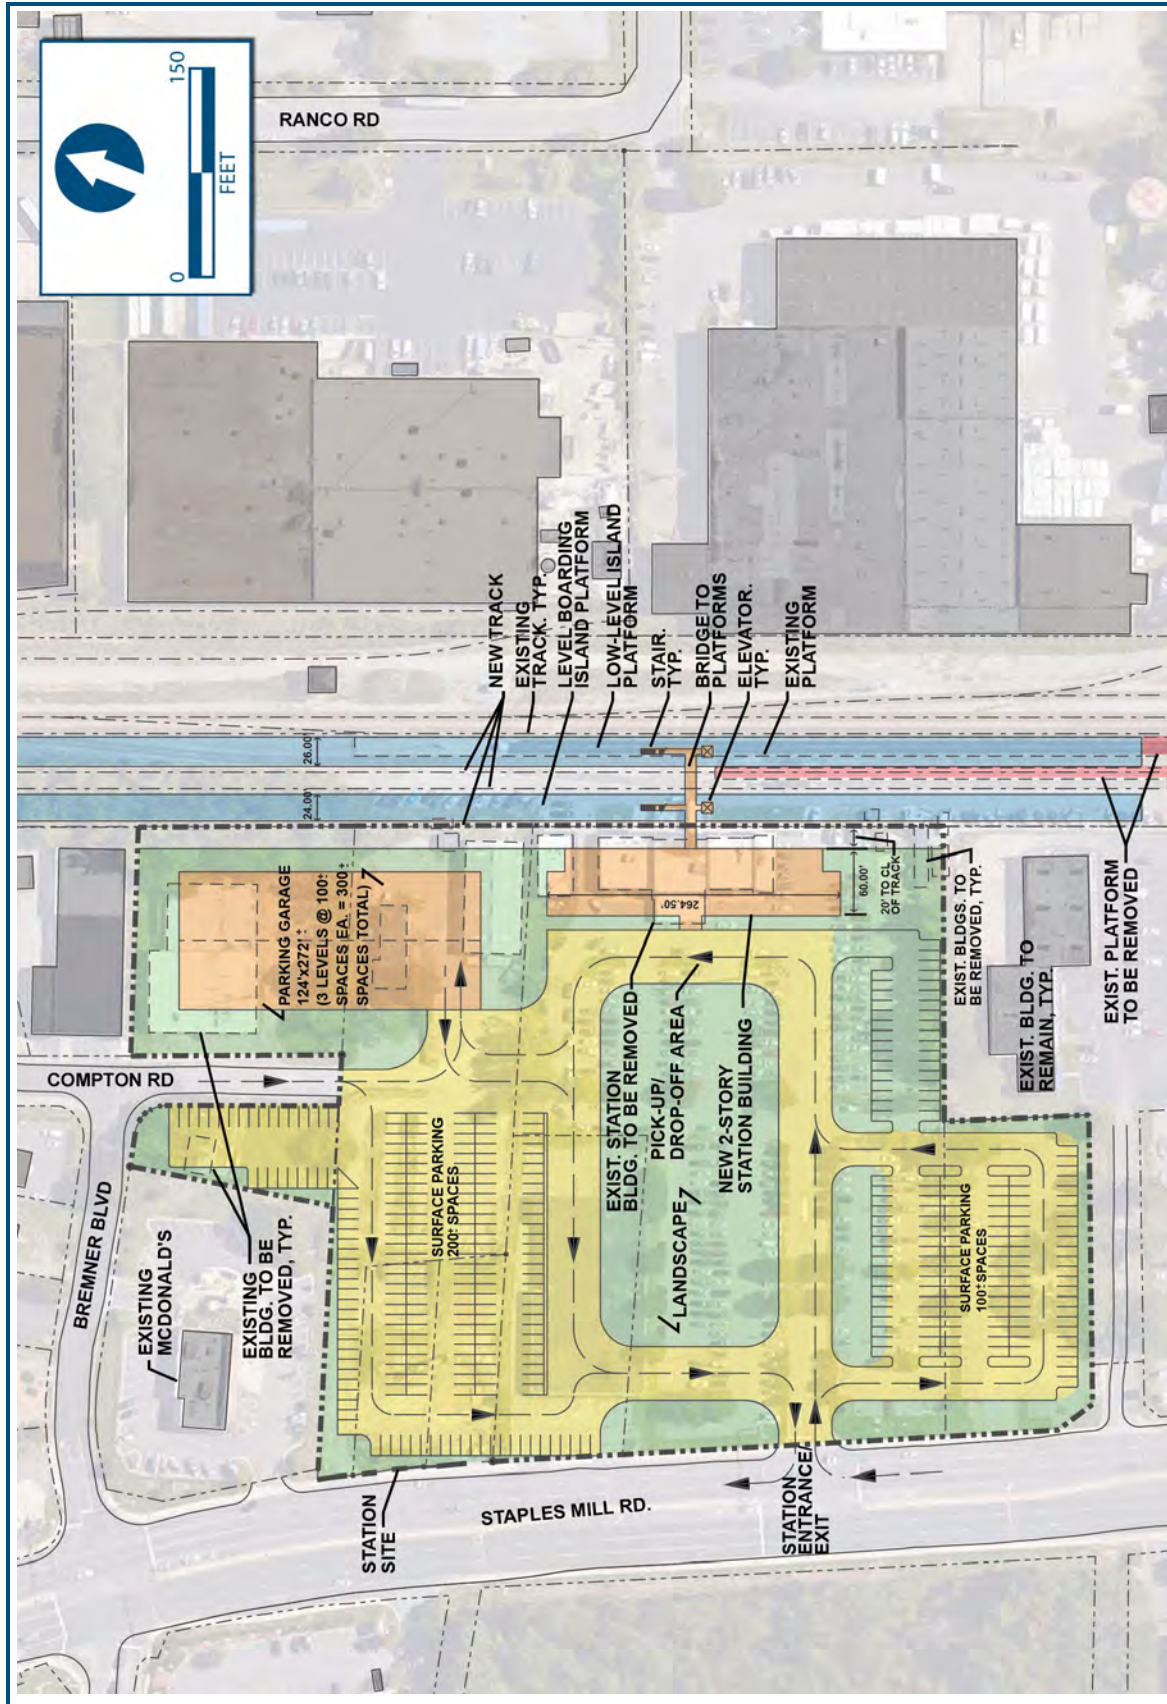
Staples Mill Road Station Improvements for Build Alternative 6E
